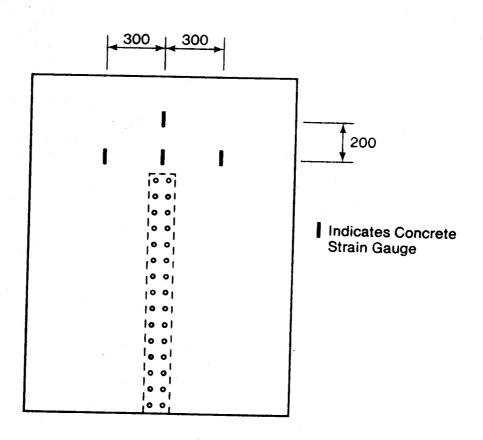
Locations of Concrete Strain Gauges on Slab of Stub Specimen
